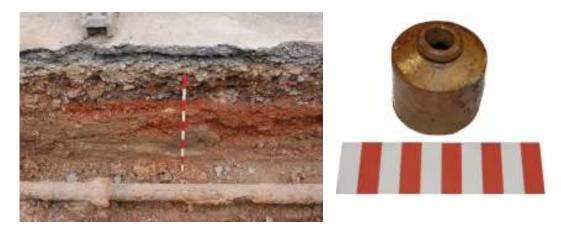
Section of trenching on Finsbury Park Road (12/08/10) and a 19th century stoneware ink bottle from later made ground deposits (10cm scale).
